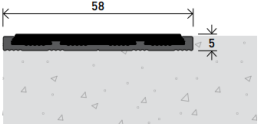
(B) A TYPICAL STAIR NOSING PROFILE WITH EXPOSED NOSING STRIP
